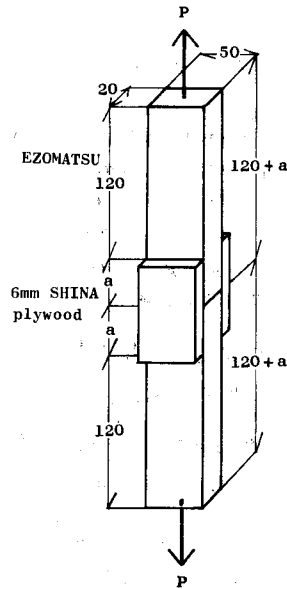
Tension test specimen of plywood gusset. (unit: mm)
